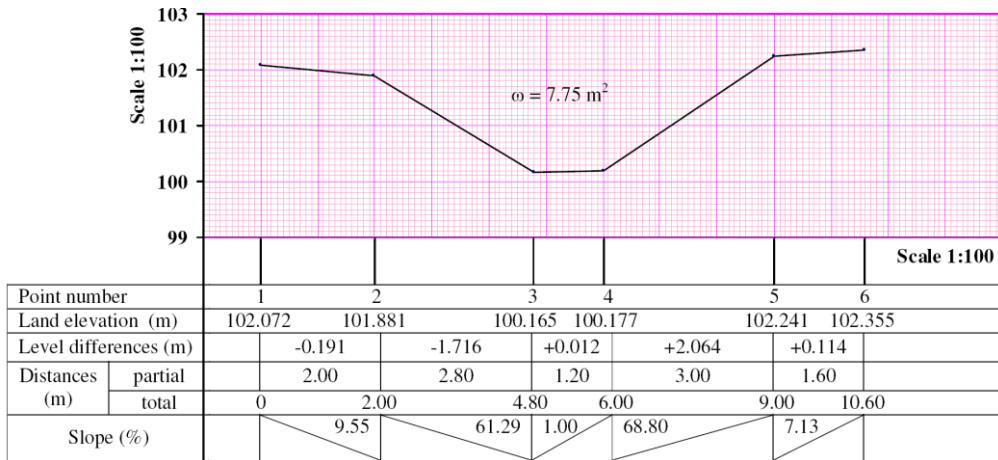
The cross-section of the channel CC<sub>1</sub>, 400 meters downstream of the culvert blocked
